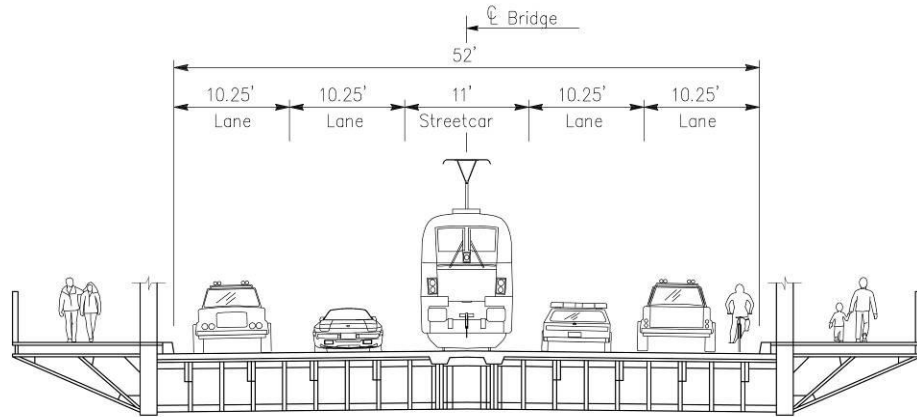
Typical Section of Tower Bridge showing lane configuration Alternative 1 - two through traffic lanes in each direction and one dedicated streetcar track with no shoulders/bike lanes.
